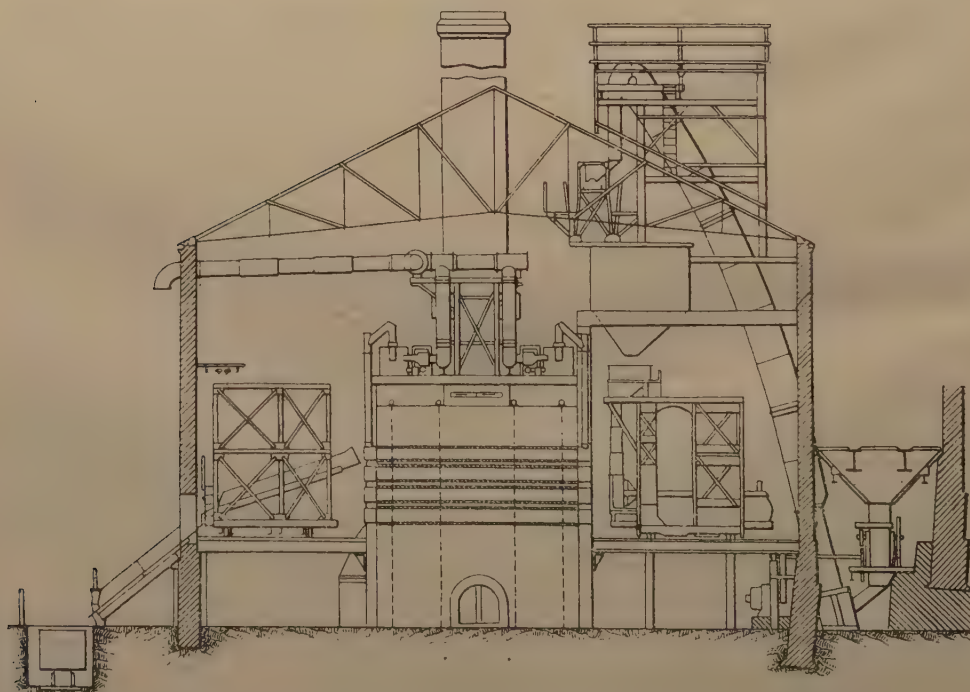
Crewe gas works. Cross section through retort house and benches.
